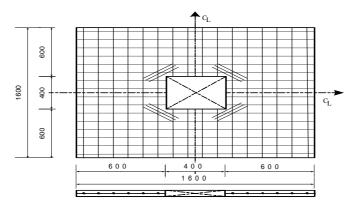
Reinforcement Details of Test Panel W40 (Units=mm)
